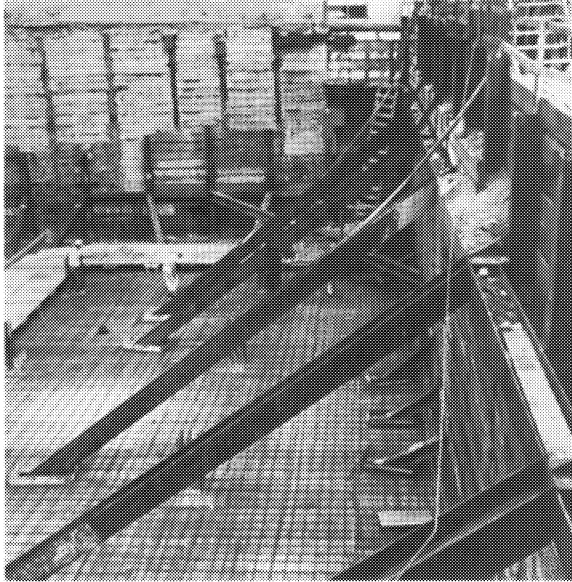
A soldier beam wall stabilized with wales and inclined shores called rakers. [Ref. 3]
